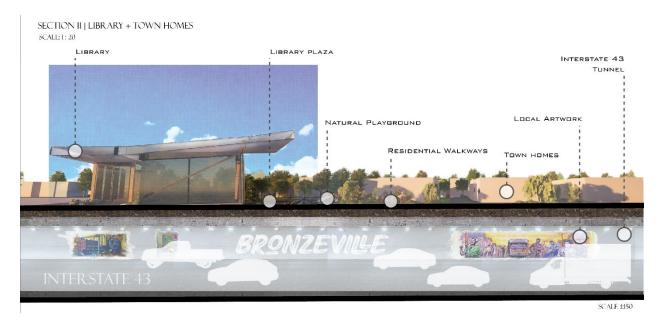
Library + Town Home Section Note: This is section I (Sec I) on the master plan.
